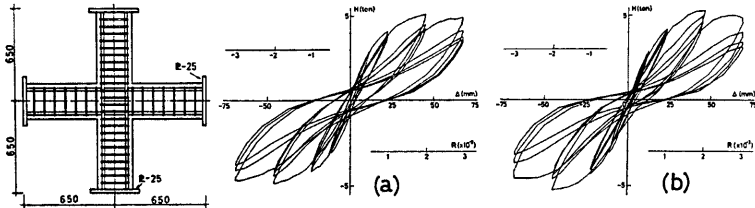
Load-deflection relationships of reinforced concrete beam-to-column connections (a) Failing in shear (b) Failing in bond
